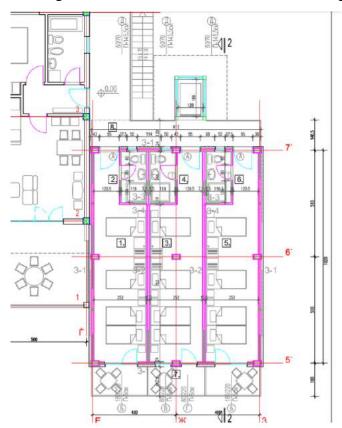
Design of the ground floor in extension/addition to existing accommodation facility
